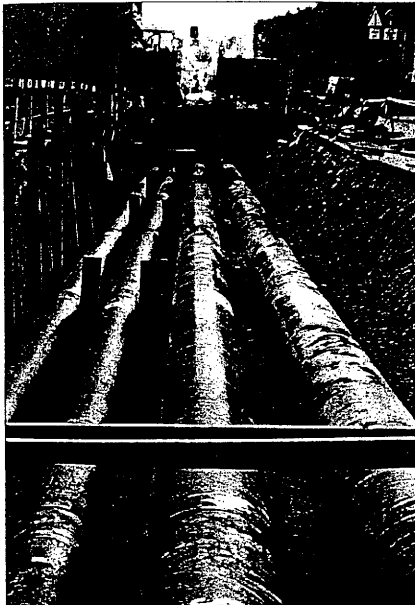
Parallel installation of the steel jacket pipe/pre-insulated bonded pipe
